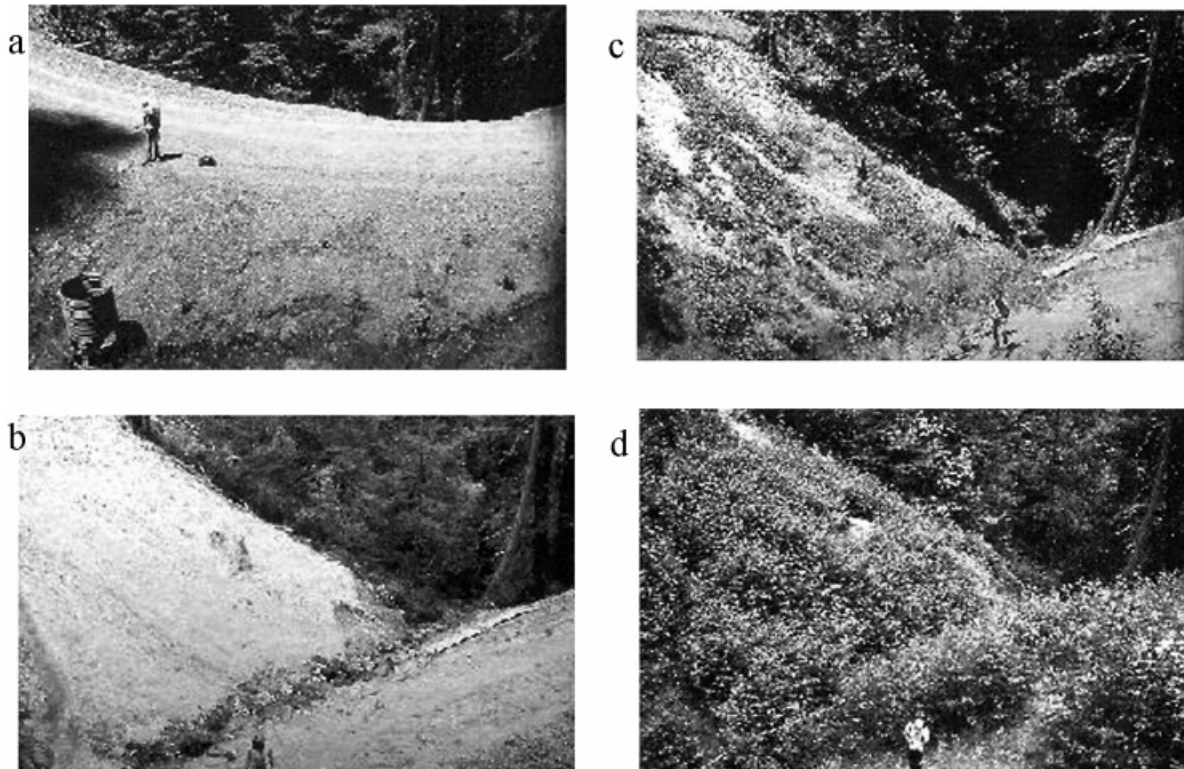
Typical stream channel excavation. (a) Abandoned logging road with intact culvert before treatment. (b) Immediately following stream crossing excavation. In this case, rock armour and check dams were installed on the channel bed to prevent downcutting. (c) Less than one year later, revegetation of the streambanks is well underway. (d) Three years after treatment, alders have revegetated most of the ground disturbed during treatment
